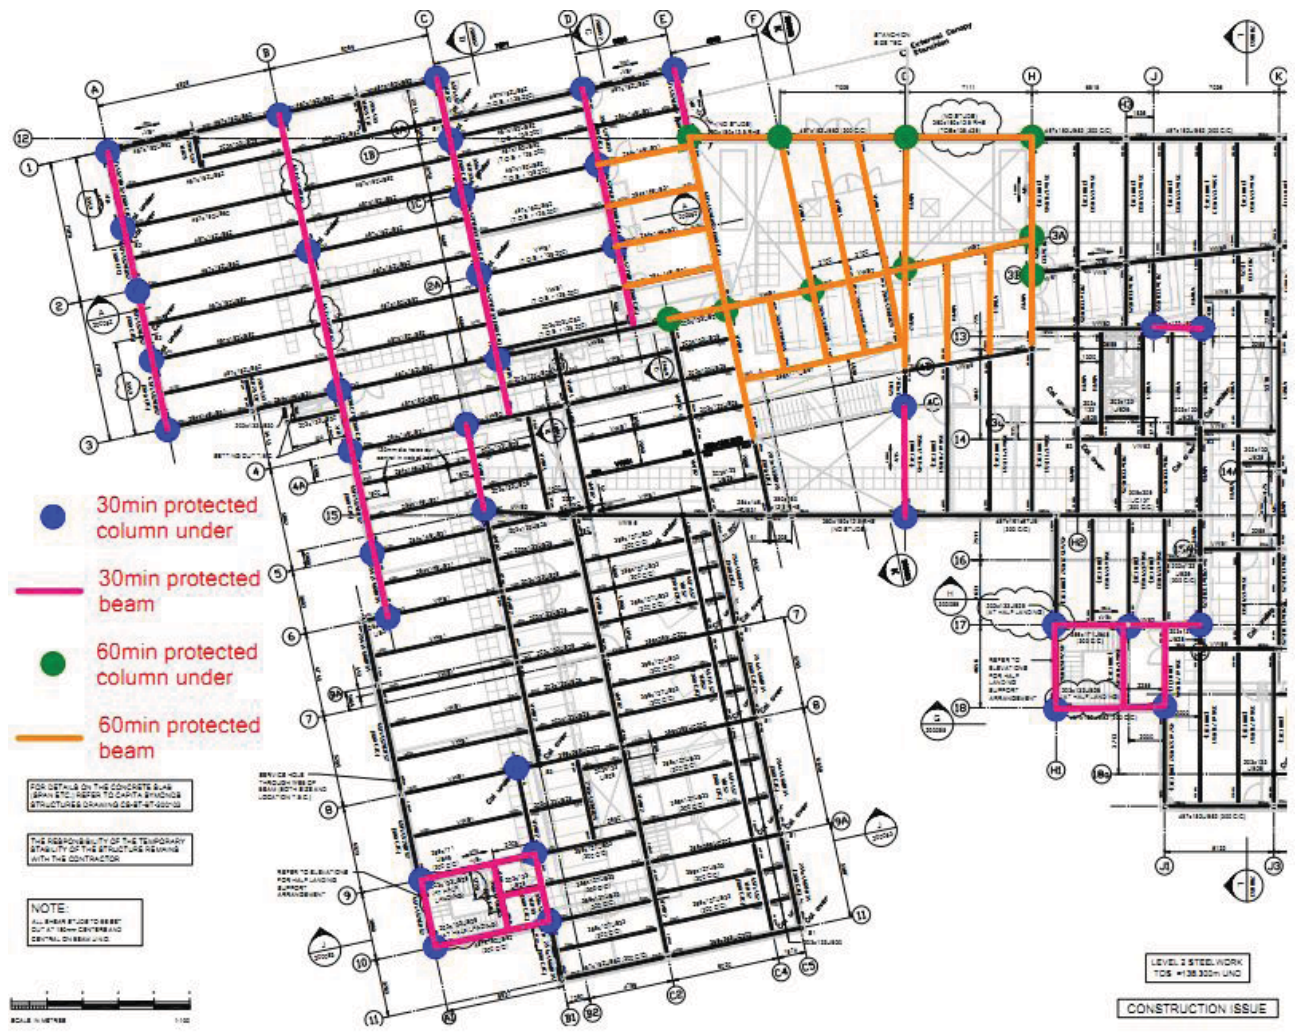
Fire protection steelwork mark-up Level 2 (partial)
